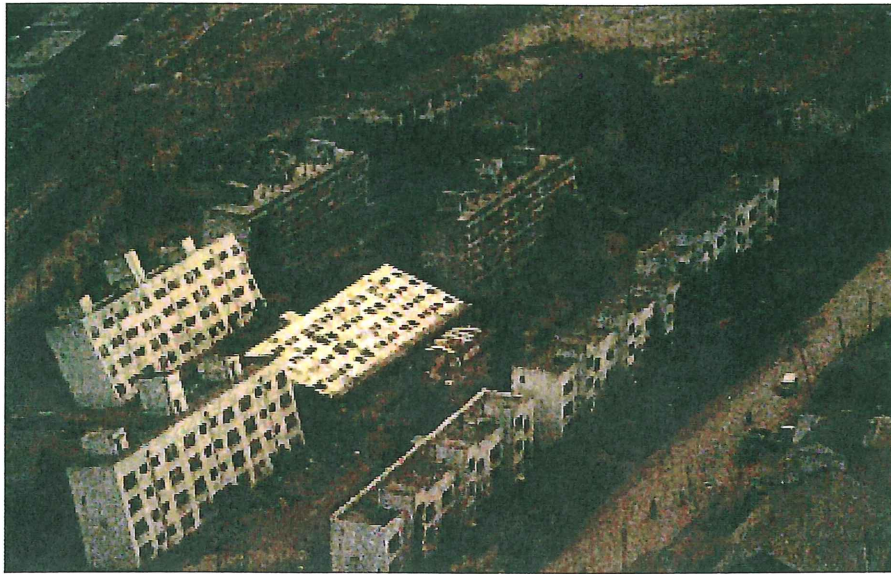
Example of damage caused by soil liquefaction, following the 1964 earthquake in Niigata, Japan. Note that the buildings are structurally intact but have tipped over because the liquefied soil failed to support their foundations. From the National Geophysical Data Center.
